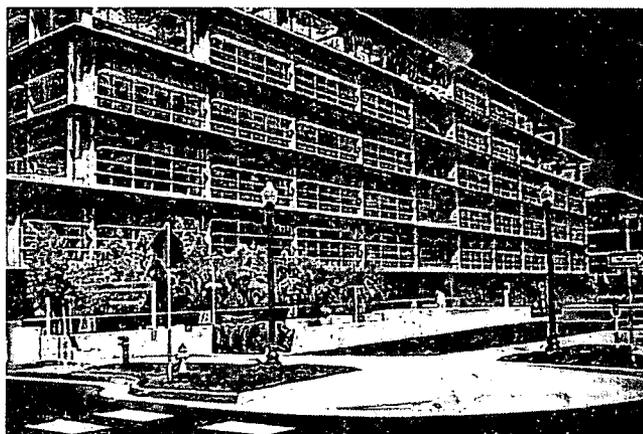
The CalPERS building, completed in 2006, is a group of 6-story office buildings arranged around an open, landscaped plaza.
